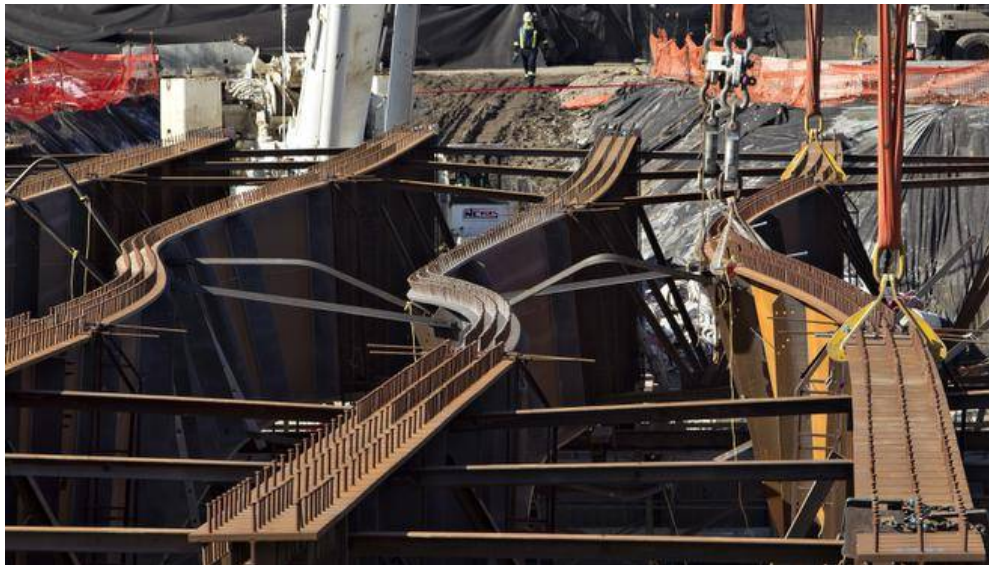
Edmonton 102nd Avenue Bridge failure (Source: Edmonton Sun)
